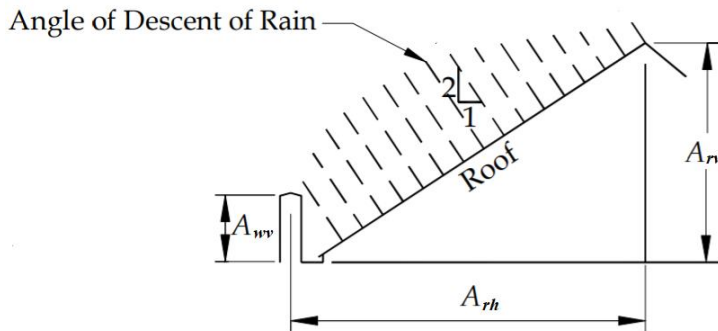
Single-slope Roof Sheltered by A Wall (DID, 2012).
